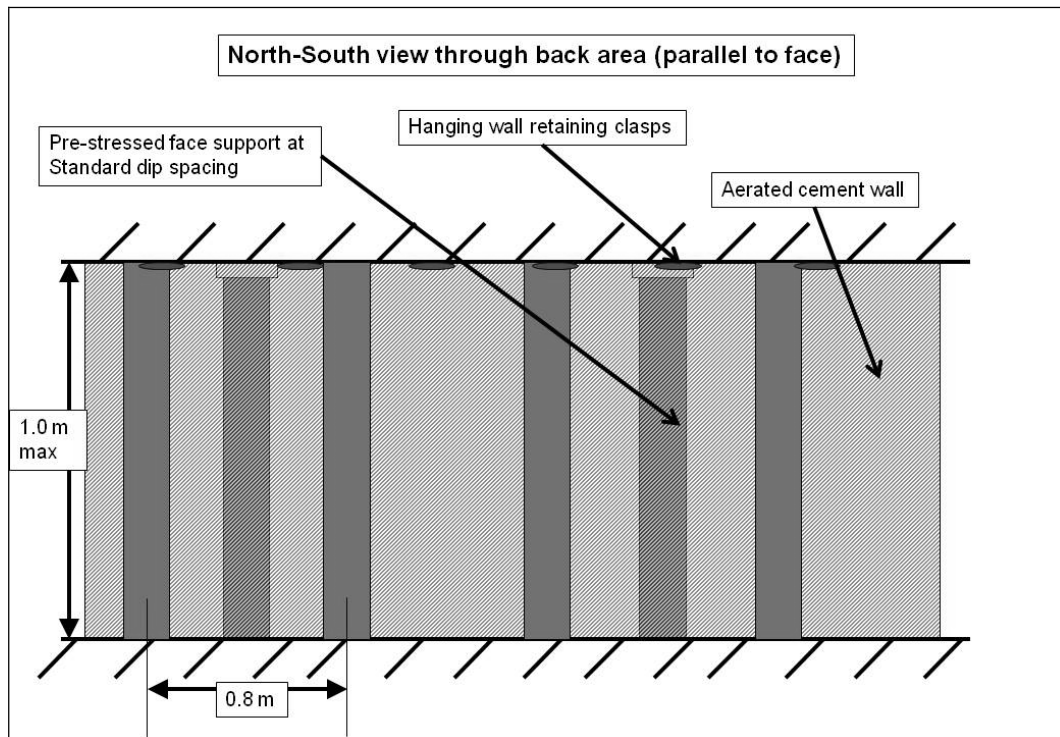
Conceptual design of rib walls (on dip, view looking East)
